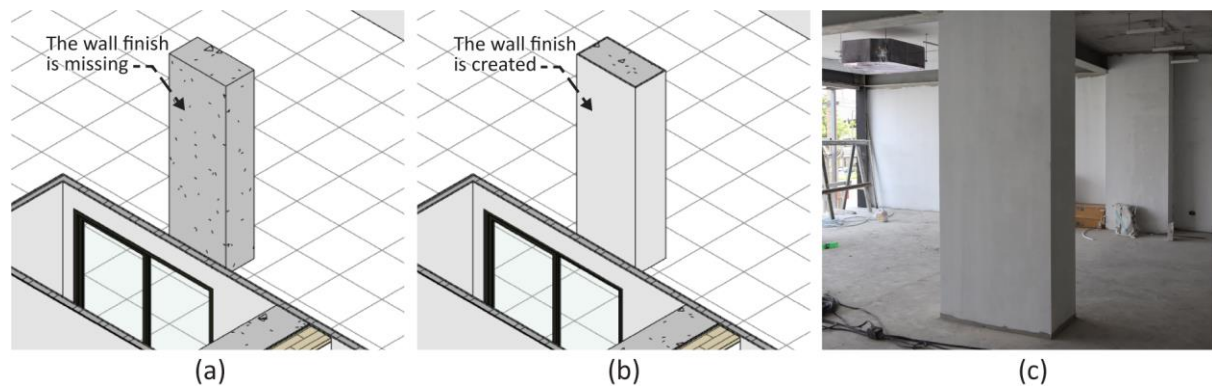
(a) The wall finish around the isolated column in the original BIM model is missing. (b) The wall finish that covers the isolated column in the manually modified BIM model. (c) The wall finish that covers the isolated column in the actual construction.
